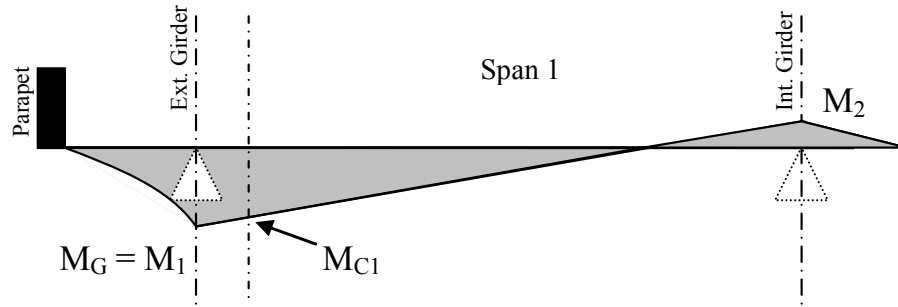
Illustration. Approximate Moment Diagram between Exterior Girder and First Interior Girder Due to Dead Loads on Overhang.
